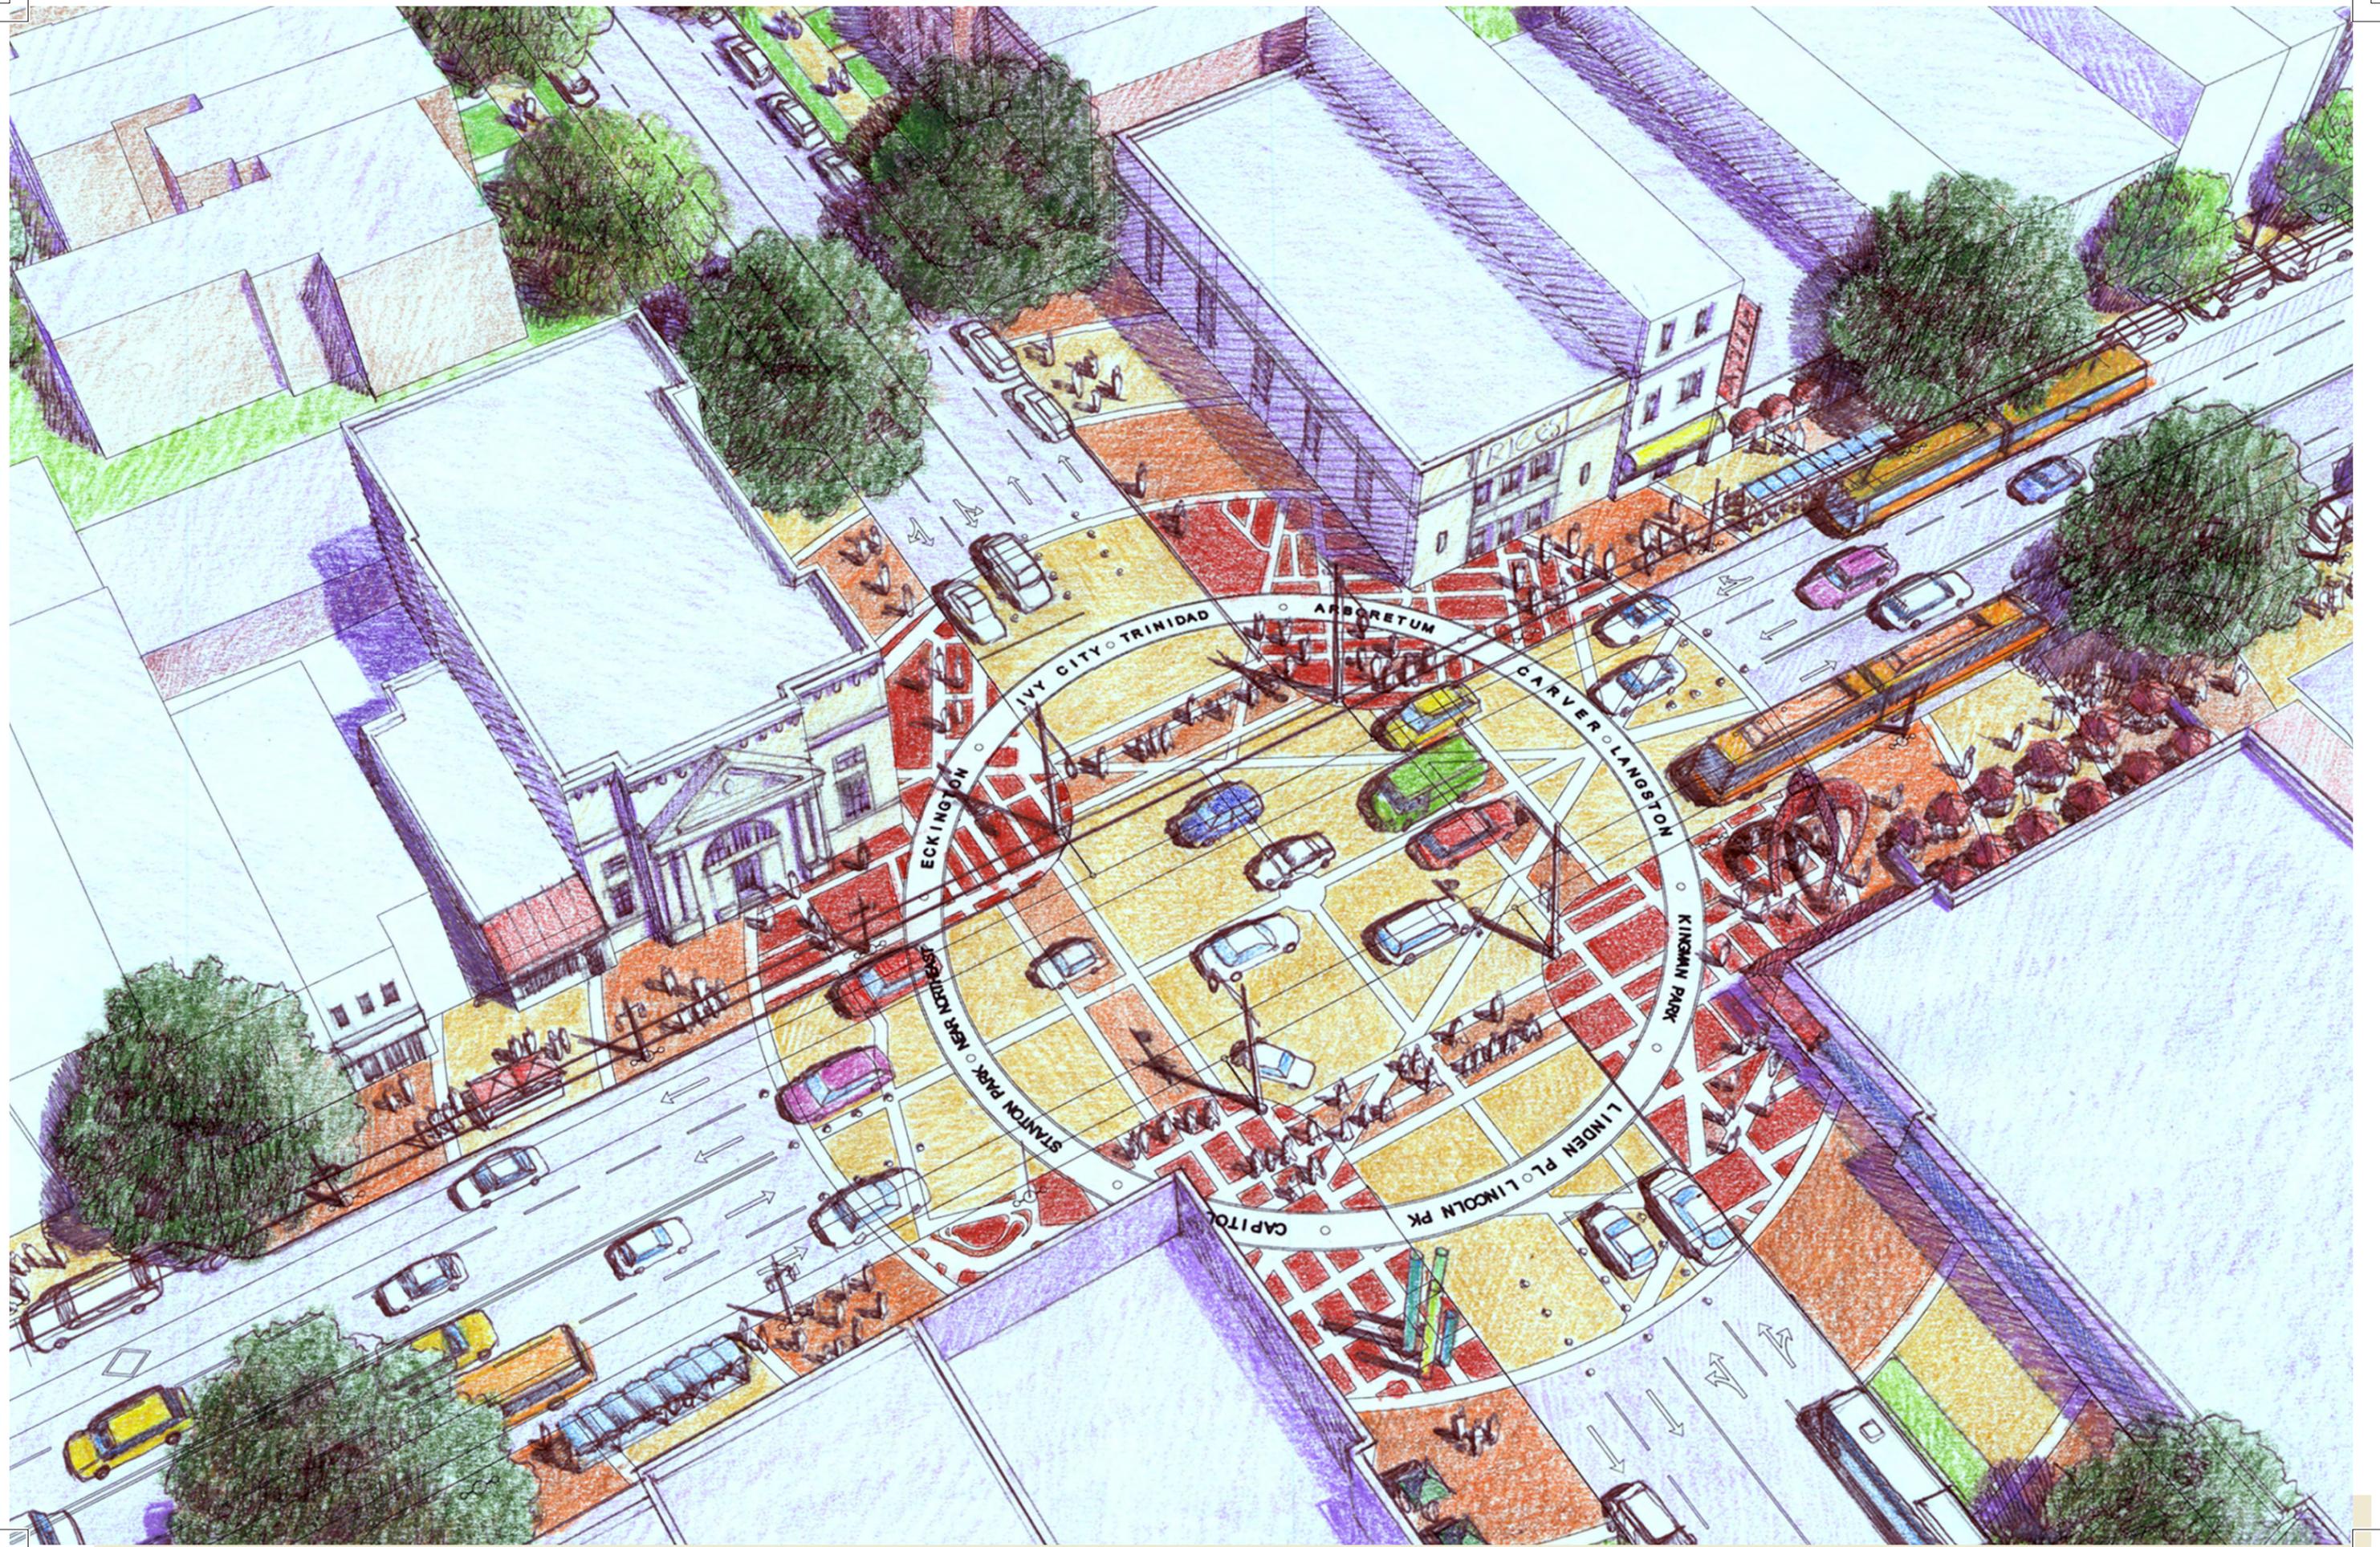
(opposite page): Aerial View of 8th and H Streets NE Intersection Looking North
